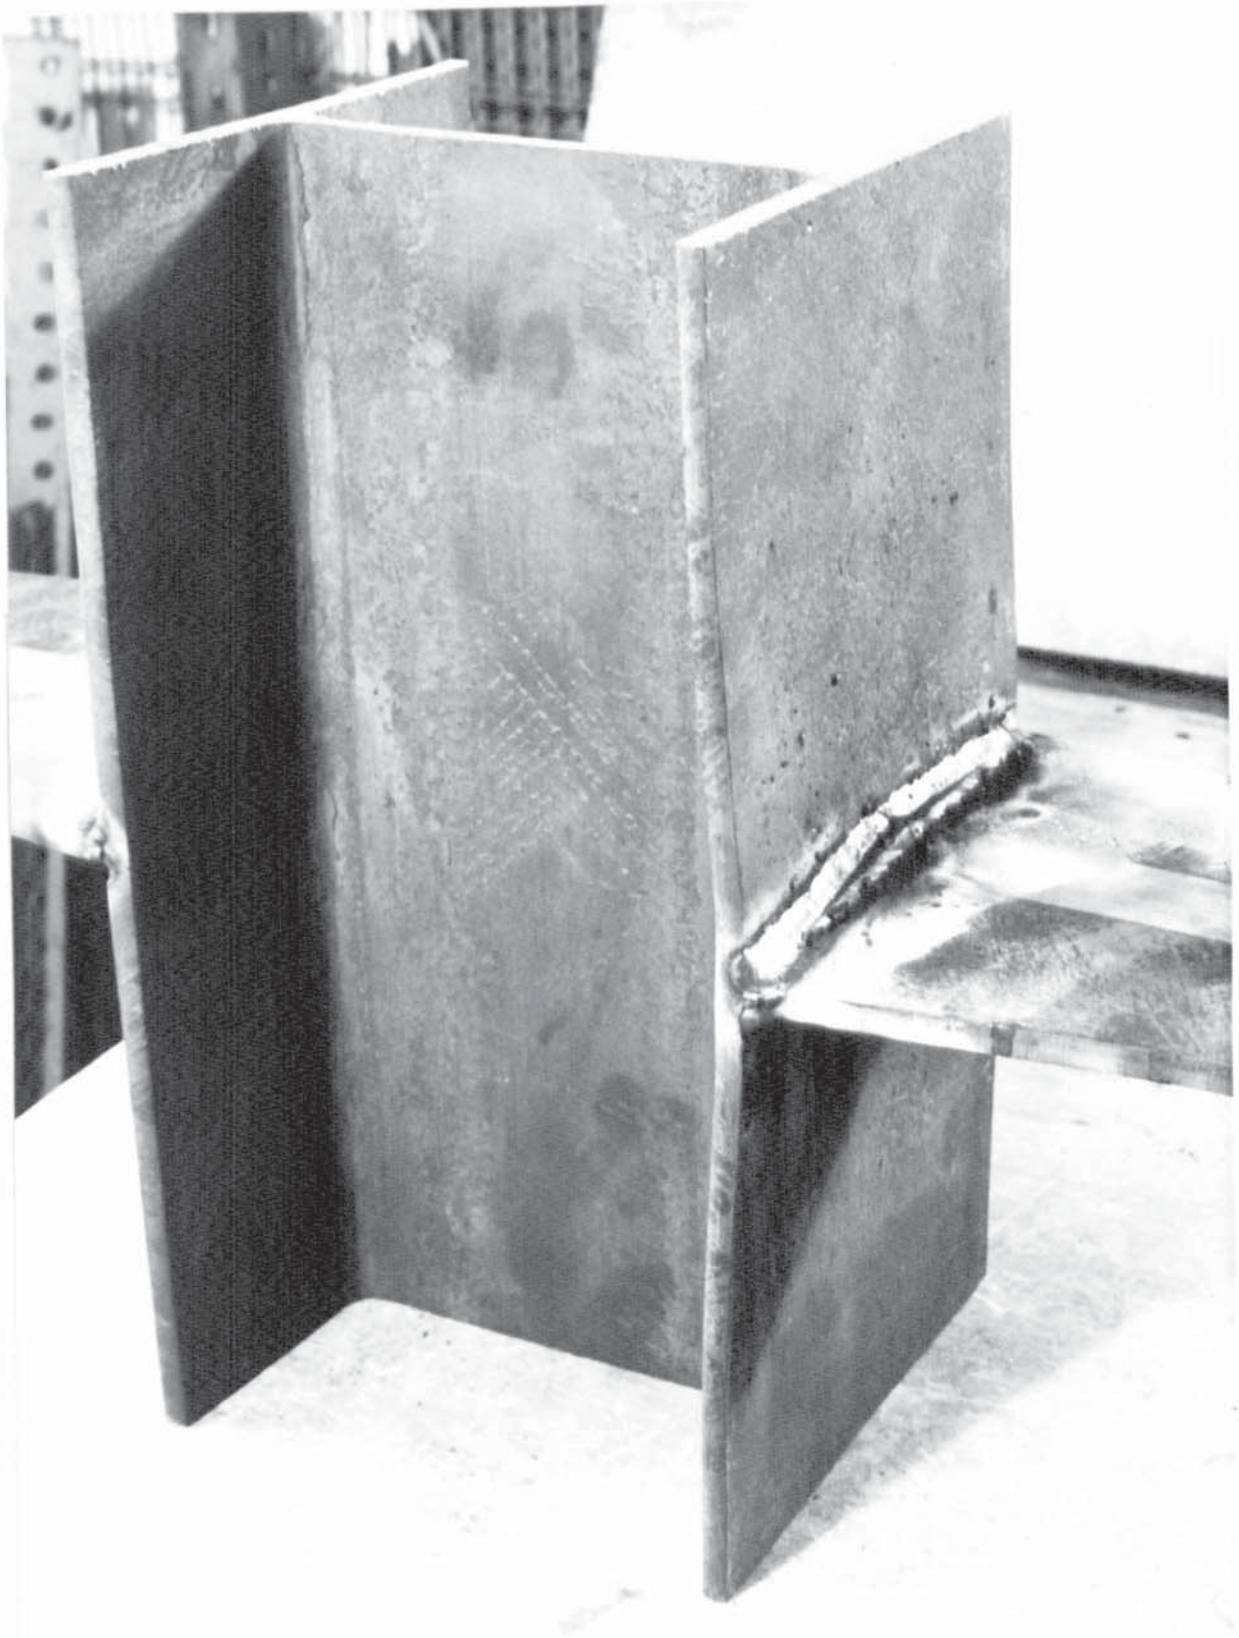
Test specimen for the determination of the effect of flange flexibility showing flange deformation at failure.
